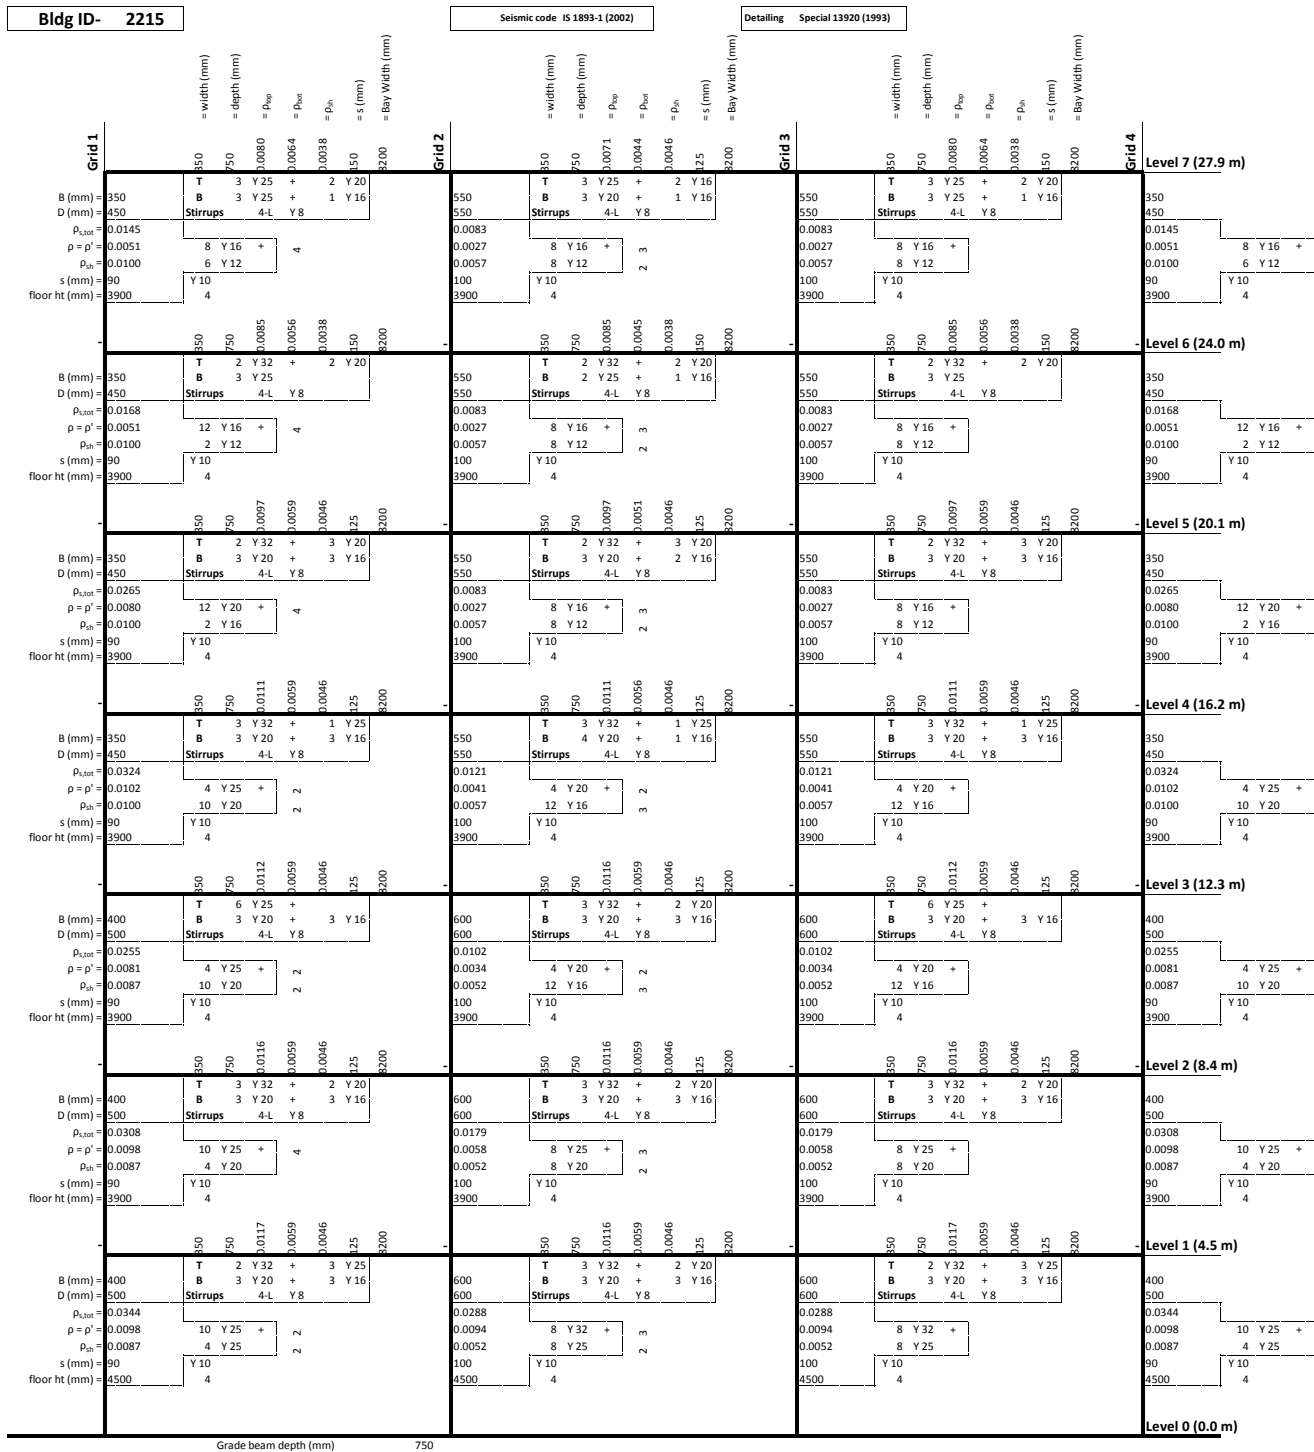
Provided reinforcement and modeling details for building ID 2215
